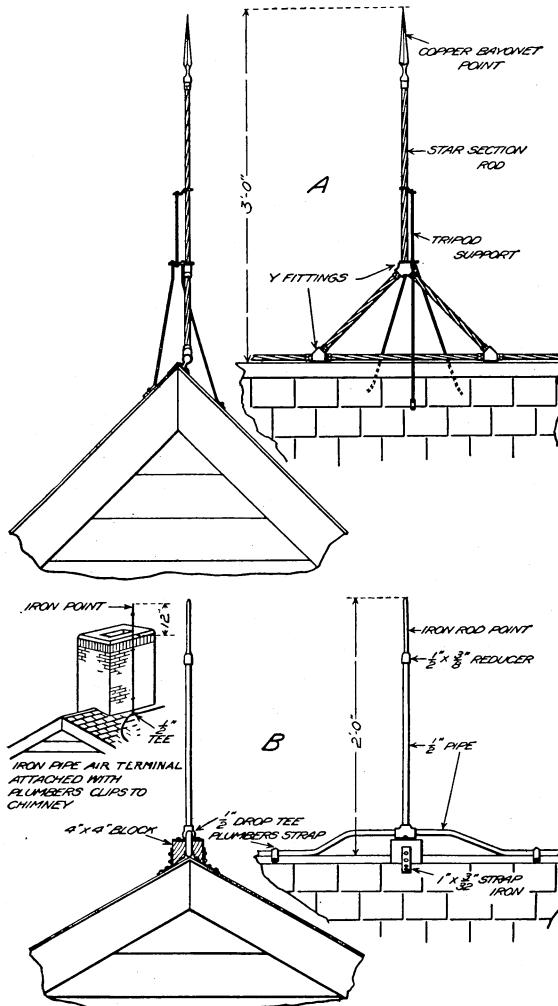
Air terminals formed of, A, star-section steel rod; B, one-half inch galvanized iron pipe and fittings
